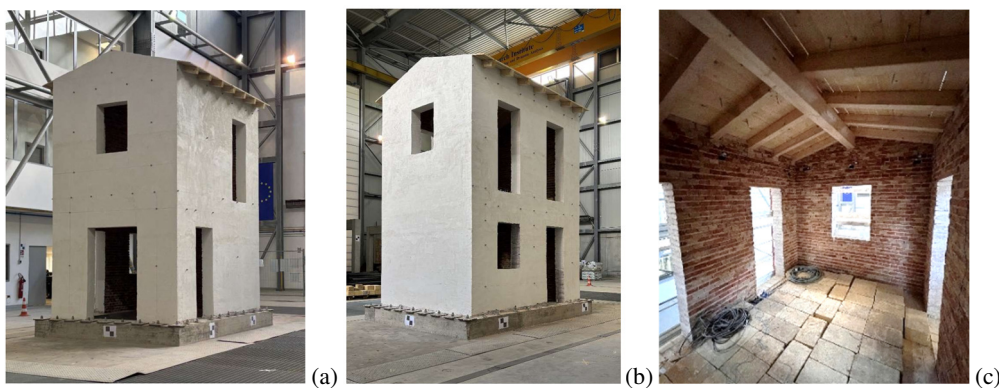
Views of the specimen: a) outer view of facades A and B; b) outer view of facades C and D; c) inner view of the specimen at the first floor.
